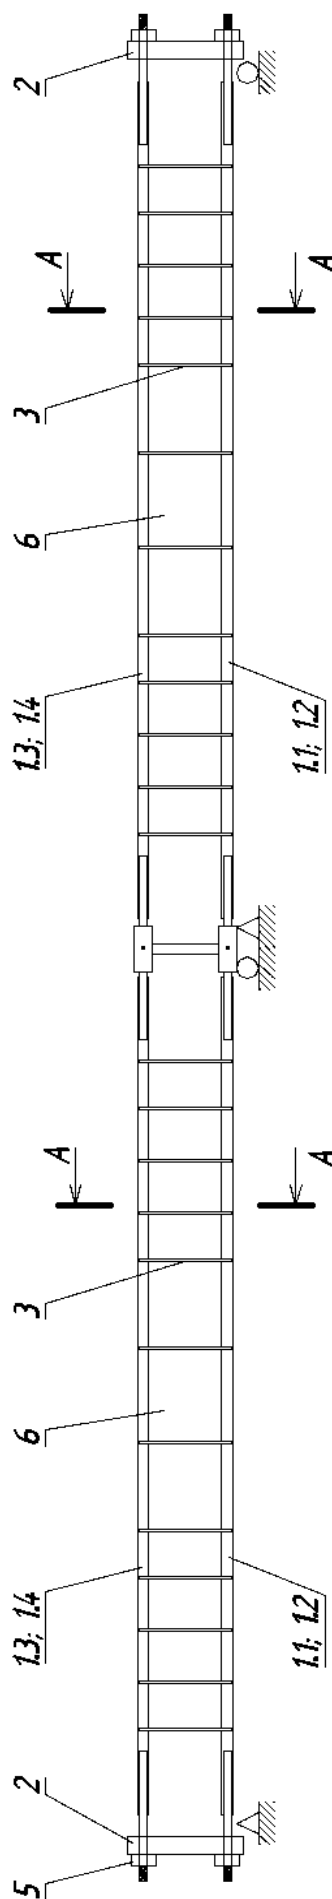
Schematic diagram of the device for reinforcing mechanically damaged through normal cracks and cross inclined cracks of continuous non-bend reinforced concrete structures using a prestressed metal clip
